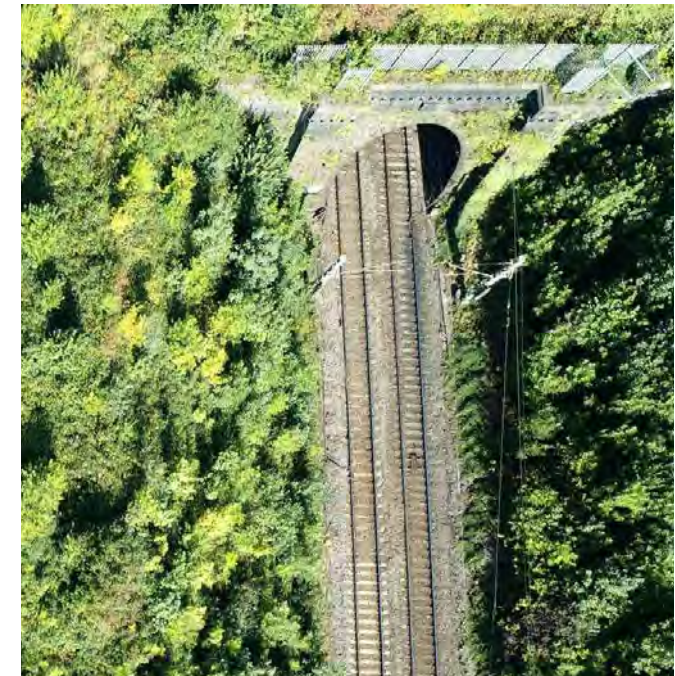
Aerial view of rail tunnel surrounded by vegetation
